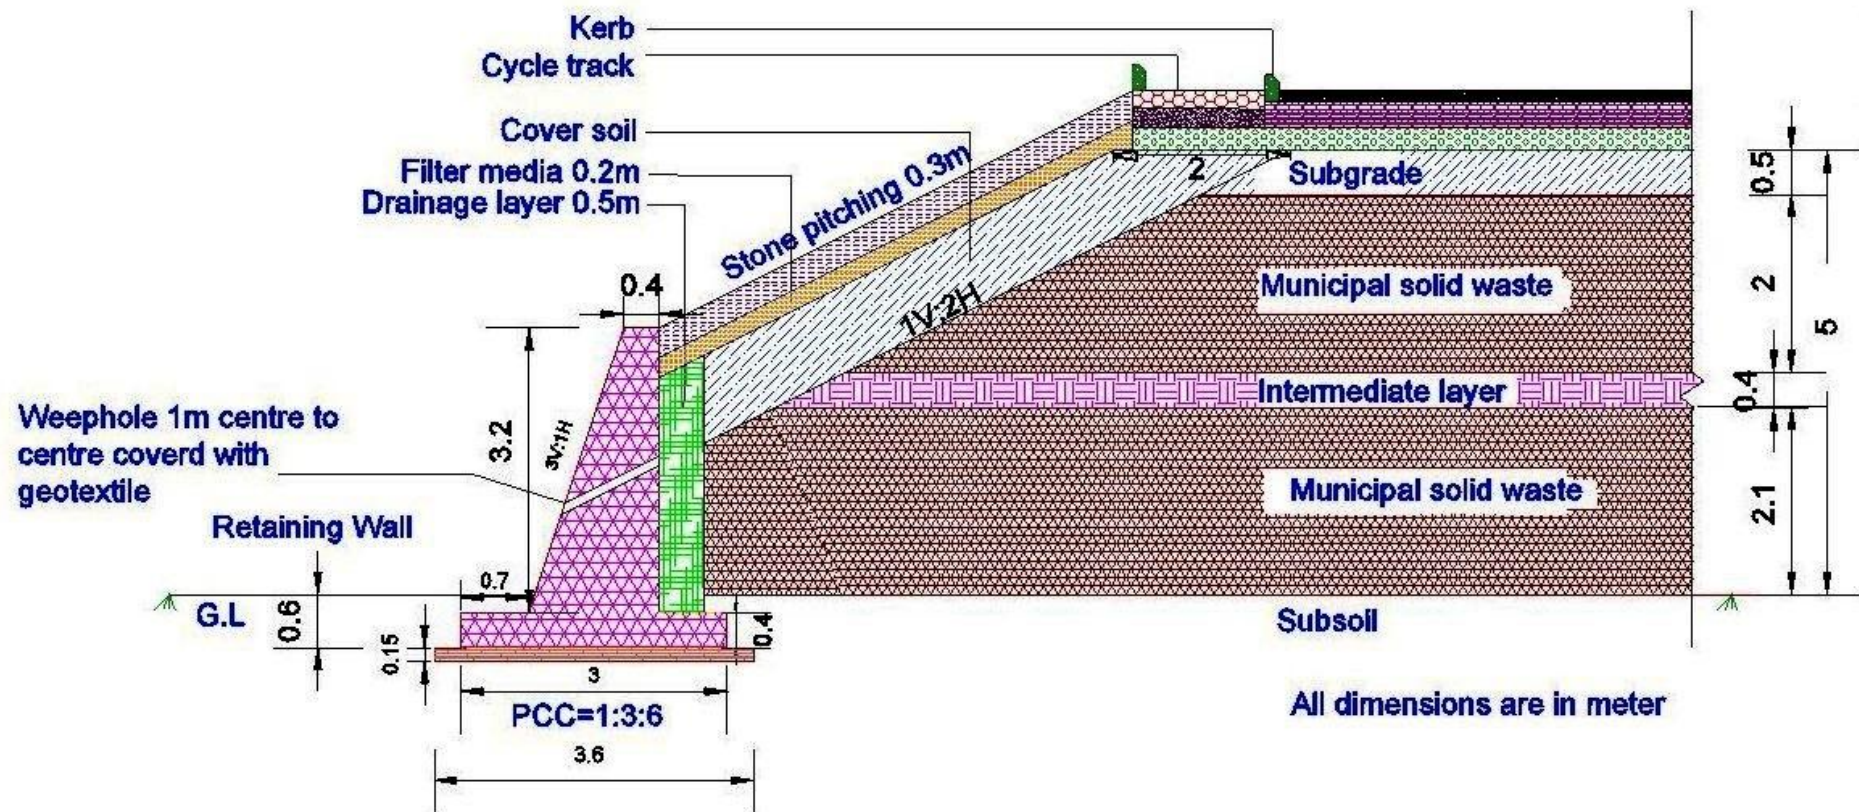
Cross –section for construction of 5m Height MSW embankment (River side)
